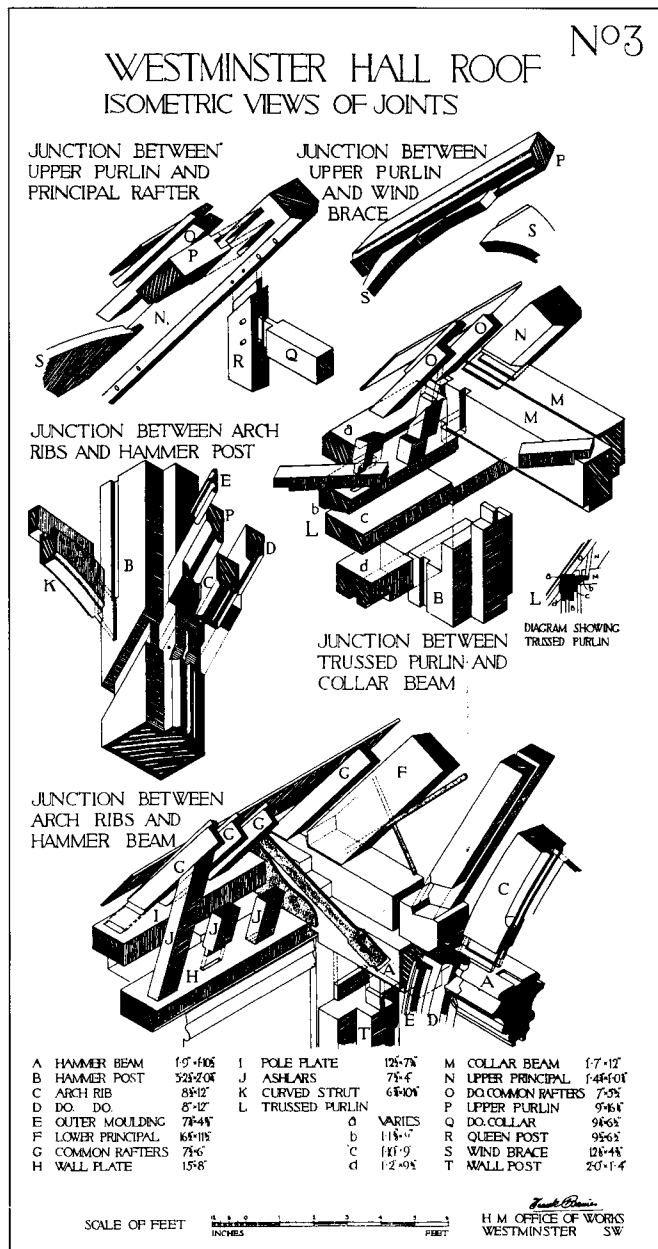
Sir Frank Baines, isometric views of joints, Westminster Hall roof, from Report on . . . Westminster Hall (1914).
